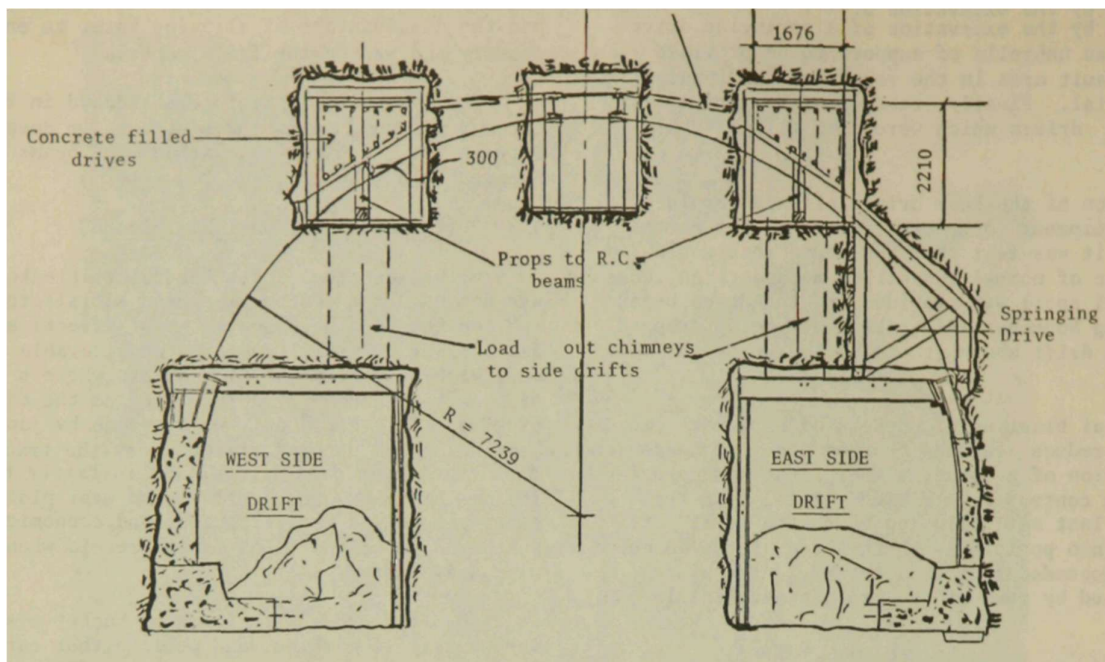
Staged excavation during construction of the existing tunnel (Newsome, 1981)
